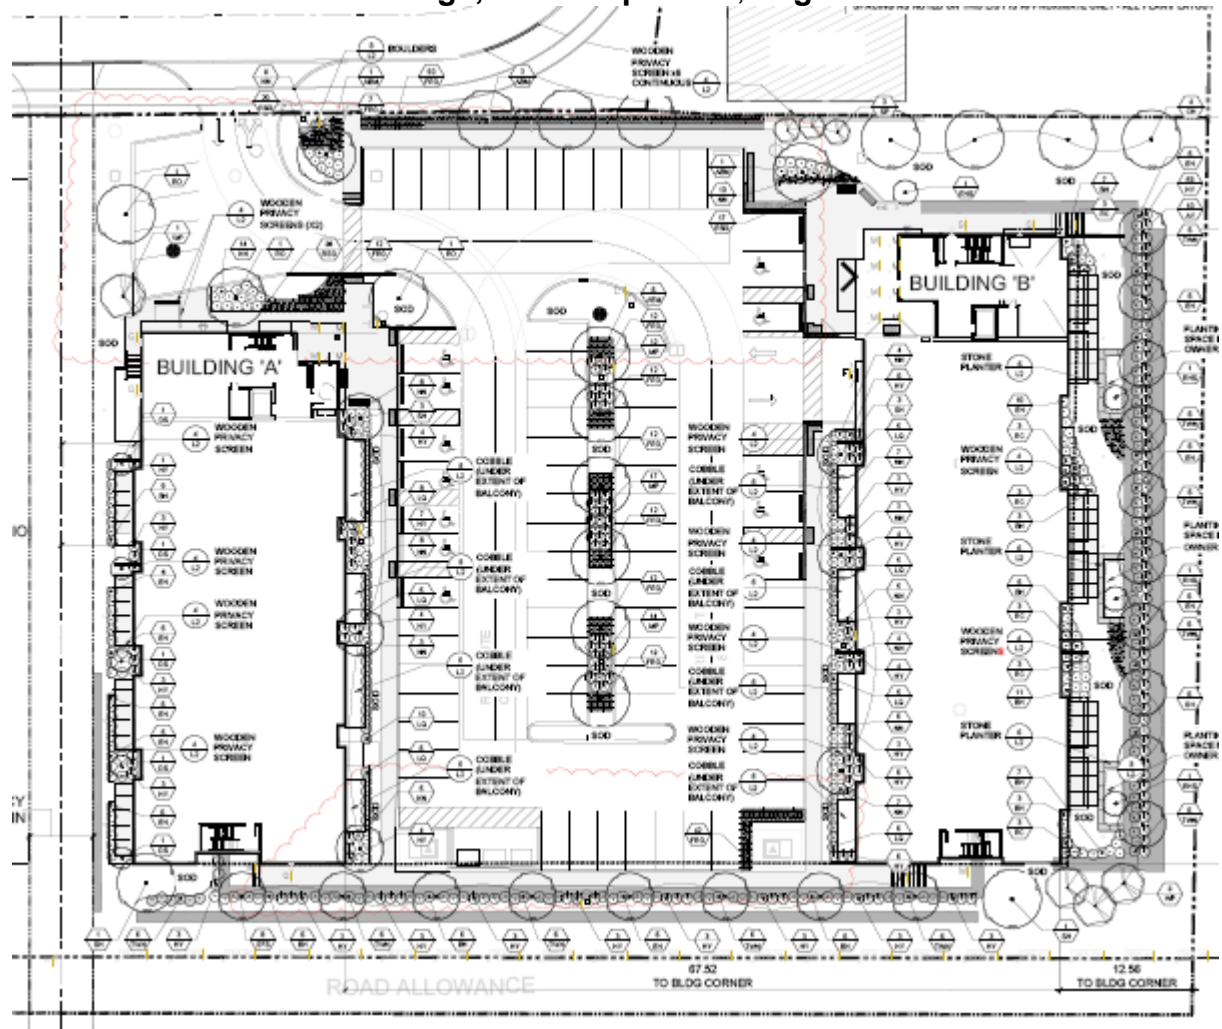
Exhibit B – Site Plan Drawings, Grading Plan, Page 3 of 6
